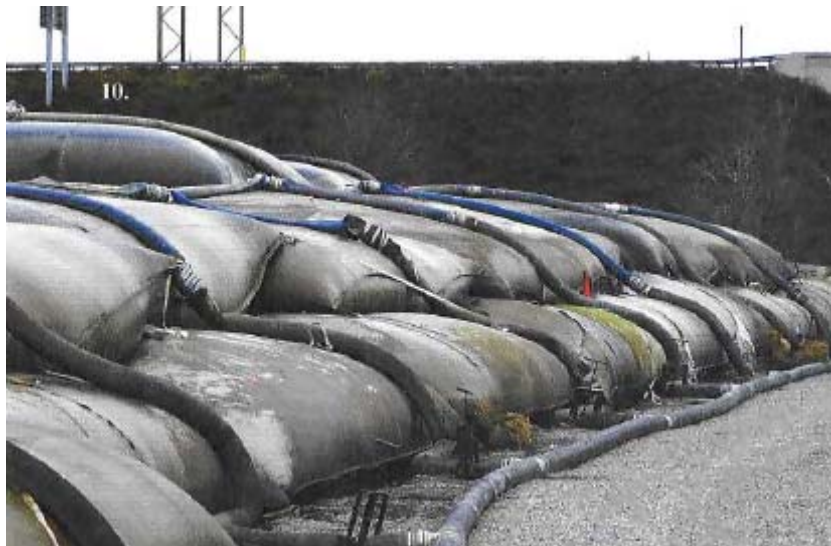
Stacked geotextile tubes with rubber piping and pinch valves.
